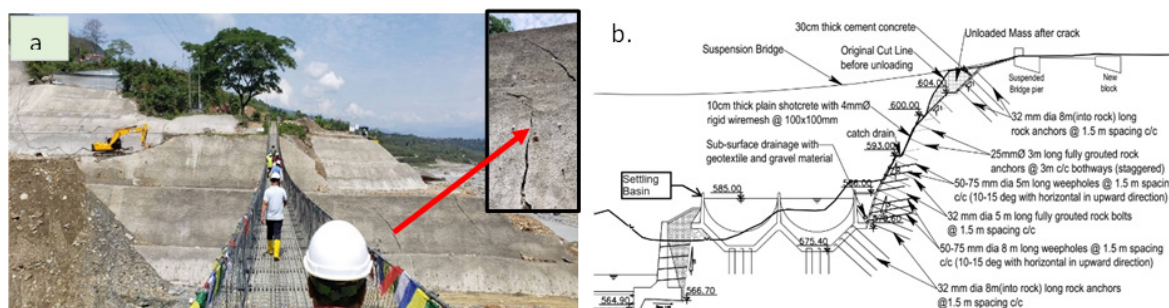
a. Excavated cut slope showing developed cracks, b. revised design of cut-slope with unloading.
